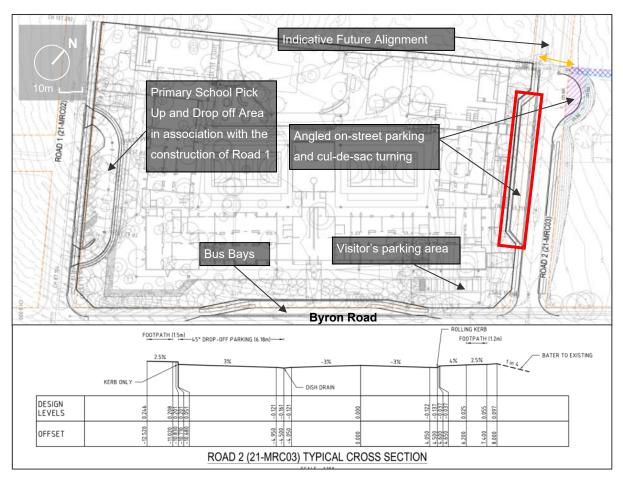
| Roads 1 and 2 location with cross-section through Road 2 (below) (Source: Applicant's RtS 2020)
